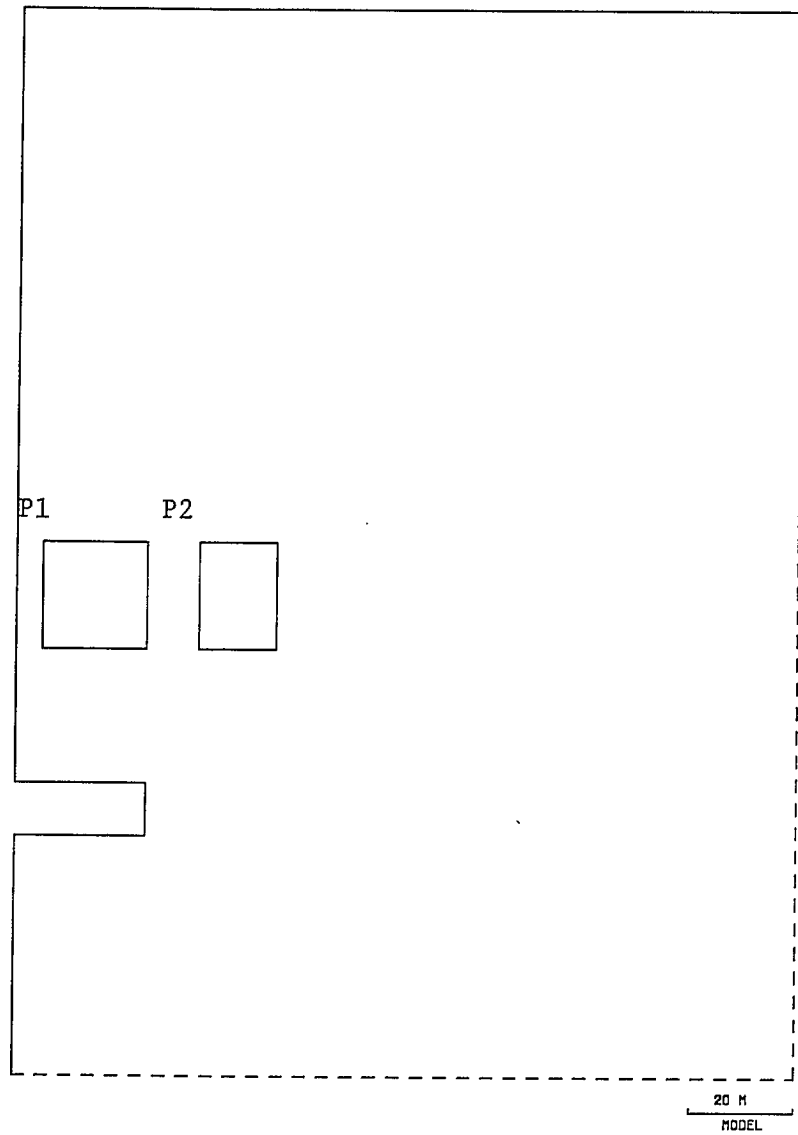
Sketch of Pillar Layout, Model 3, Section 17800E
